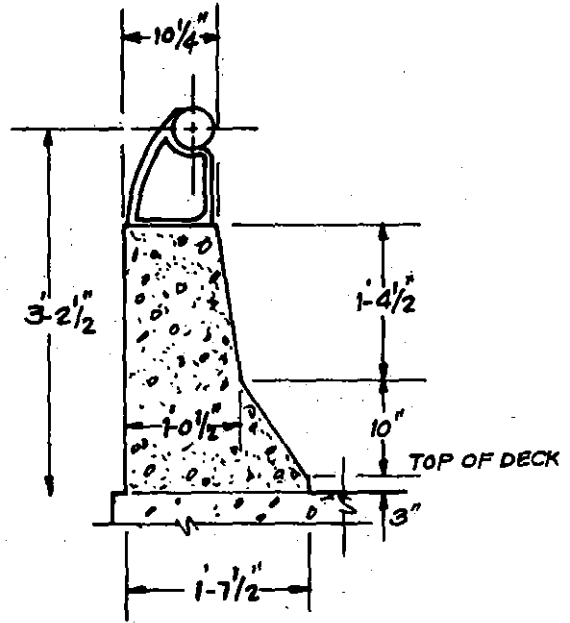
Vehicle-Parapet Kerb (reinforcement not shown) AASHTO/ACI
